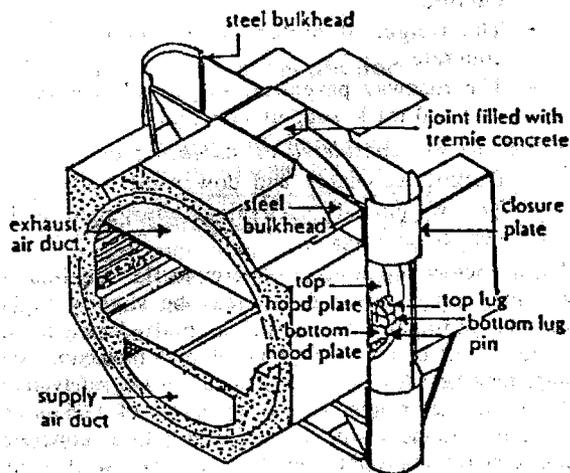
Typical Tremie Concrete Joint for a Double-Steel-Shell Tunnel
